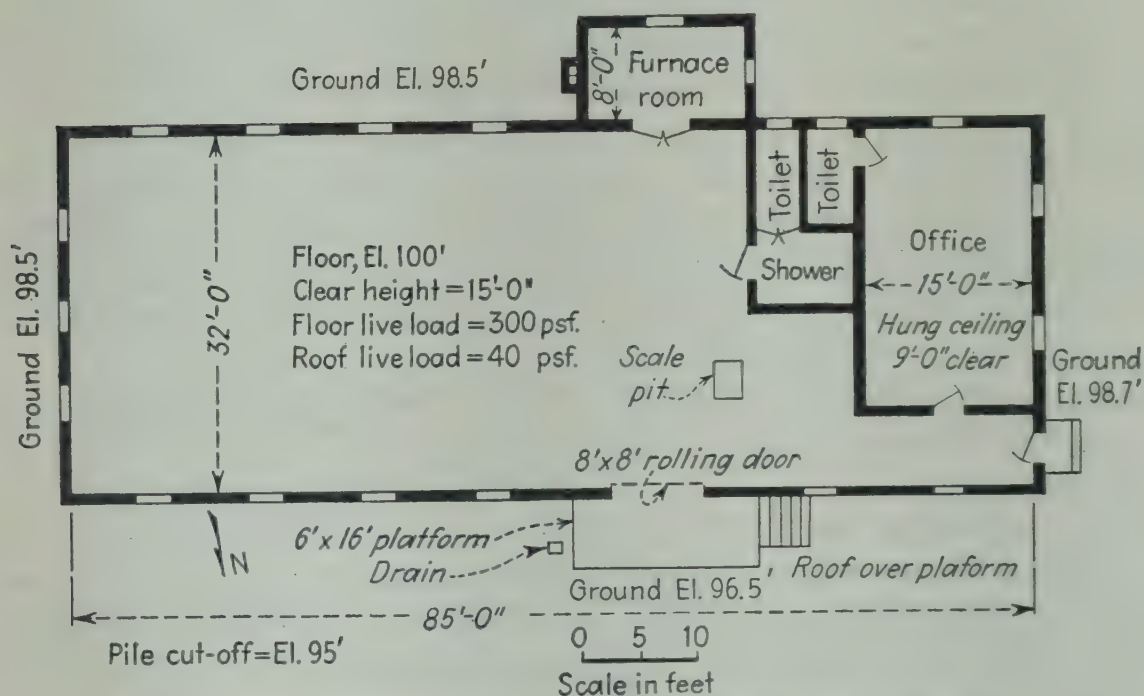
A small warehouse on poured-in-place concrete piles.
